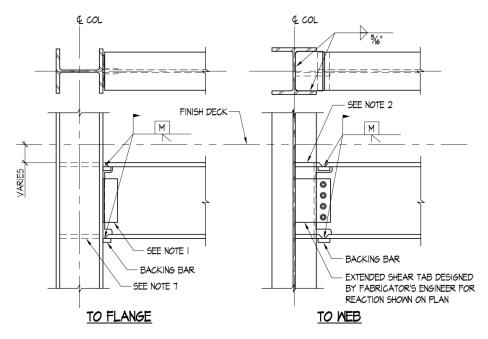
Typical Fully Restrained Moment Connection Detail (Beam to Column), 3/S2.01
